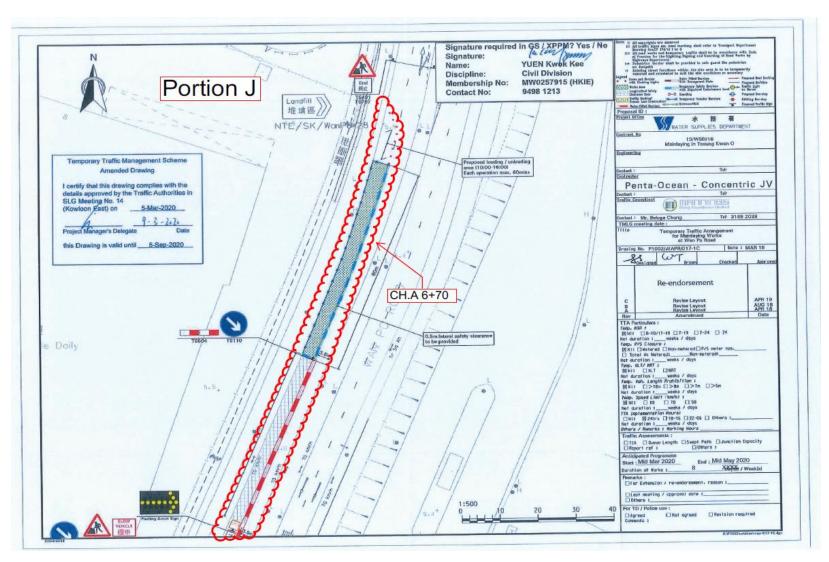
(i). Location Plan for Portion J - CH.A 6+70
